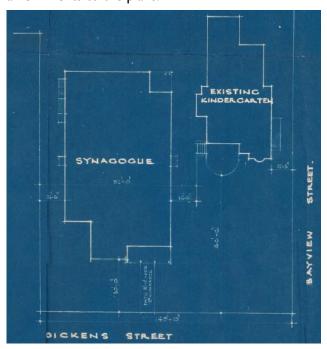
Building permit 2980 drawings (K Popper, undated). Site plan showing footprints of the kindergarten (former Allen residence) and the proposed new synagogue. Dickens Street is at the bottom. (Source: Council Building File)
